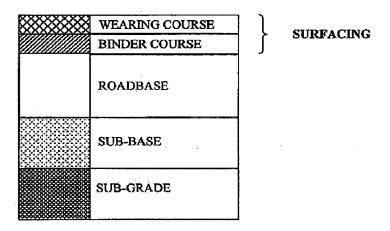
Typical section of flexible pavement (Rahim, 2007)
